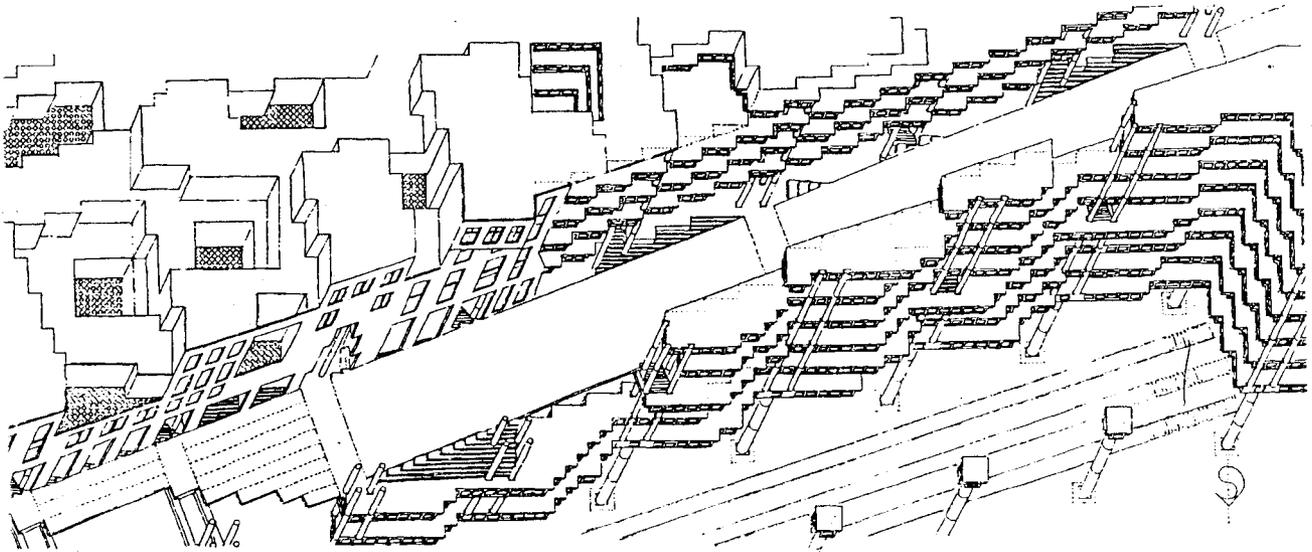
Cutaway view showing coupled pan space frame and sloped street.
